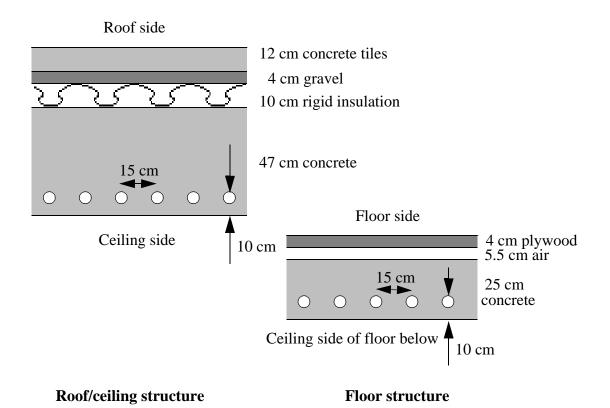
Composition of the roof and floor in the DOW Chemicals test room.
